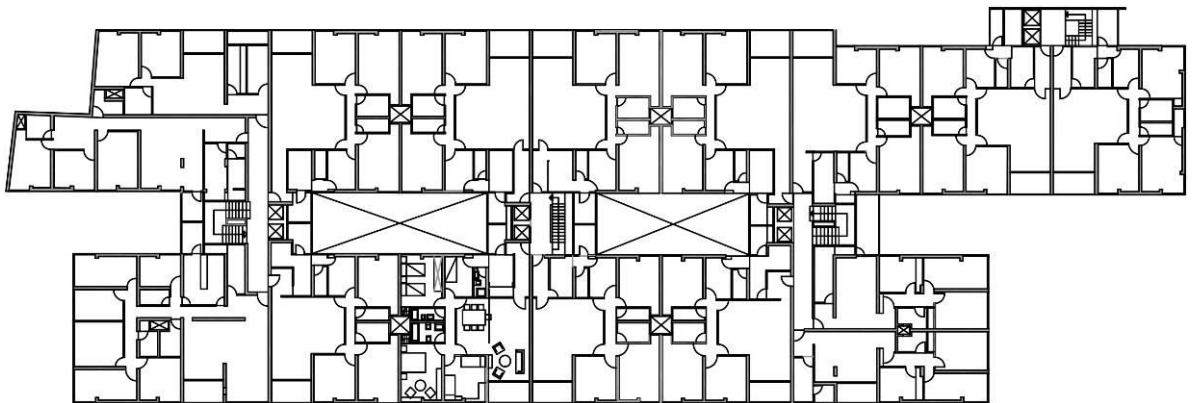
A. Bonet Castellana. Housing building Mediterraneo. Typical floor plan. Source: Redraw by M. Lucchini
